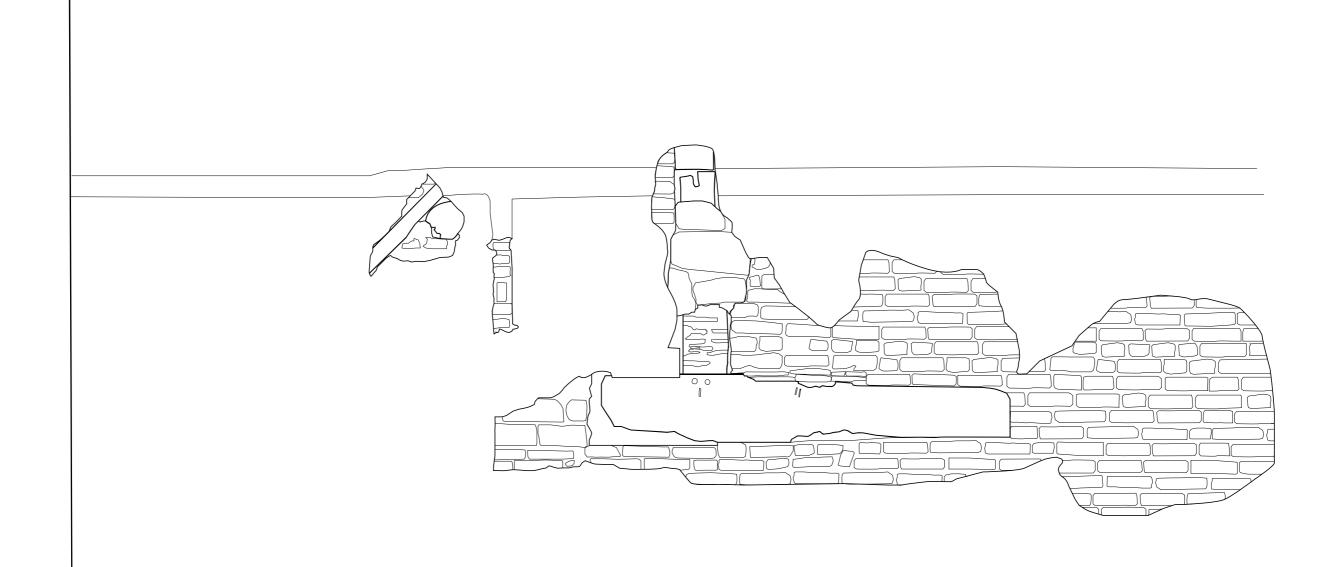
Internal east elevation of east range, and east elevation of south range (1:100 @ A3)
